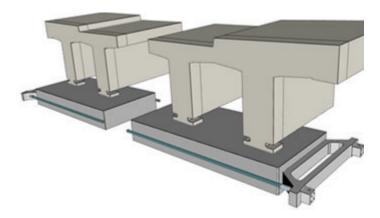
Example of external shear strengthening of a pier with CoBeam traverse.
